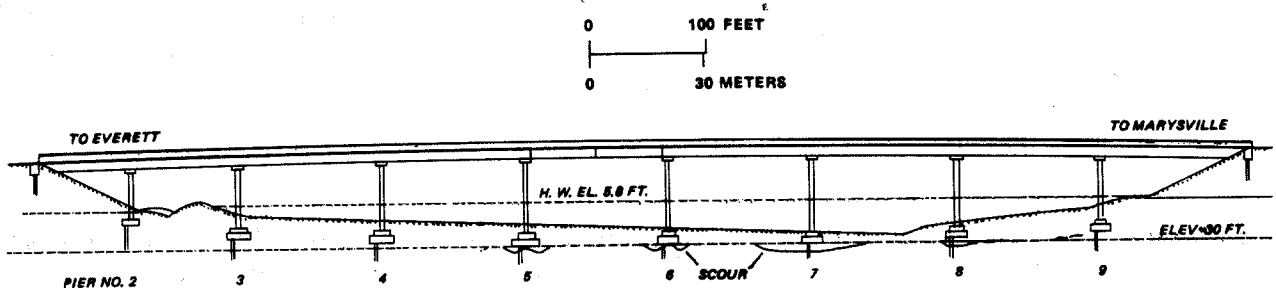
Elevation sketch of I-5 bridge at Steamboat Slough.
